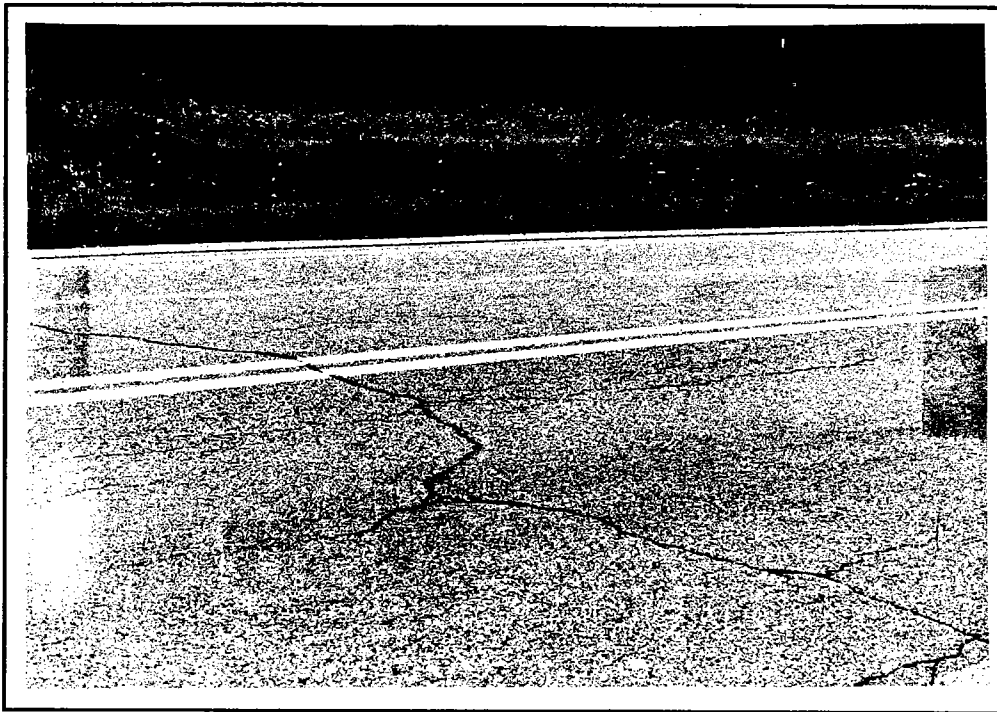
Pavement with untreated aggregate, 7A gradation in foreground, 6A background; wheelpath and other cracking.
